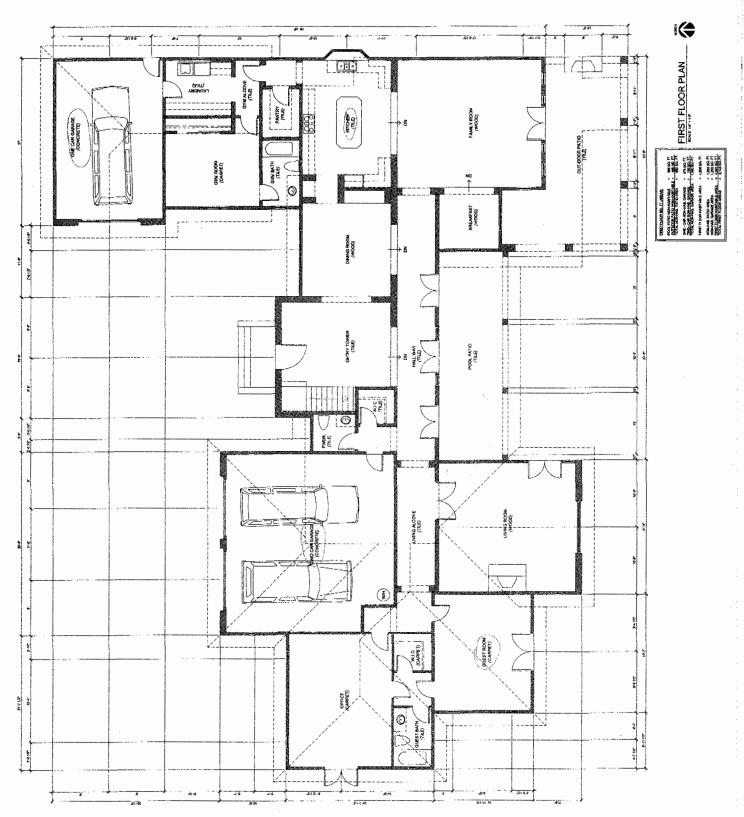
APPLICATION No. 4-05-202 FIRST FLOOR PLAN
